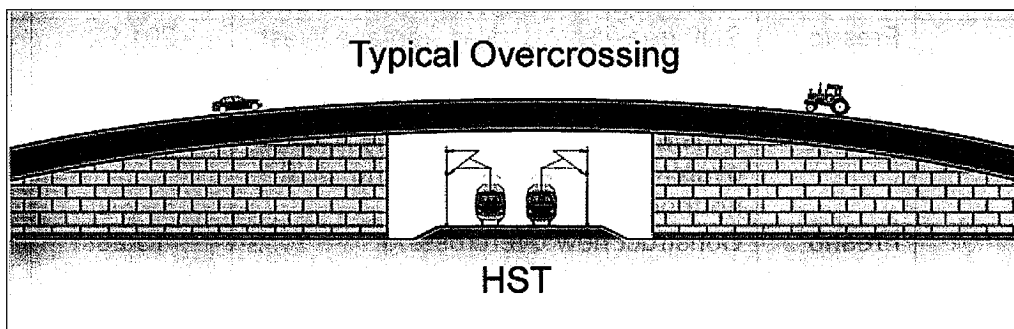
Typical Cross Section of a Roadway Overcrossing the HST
